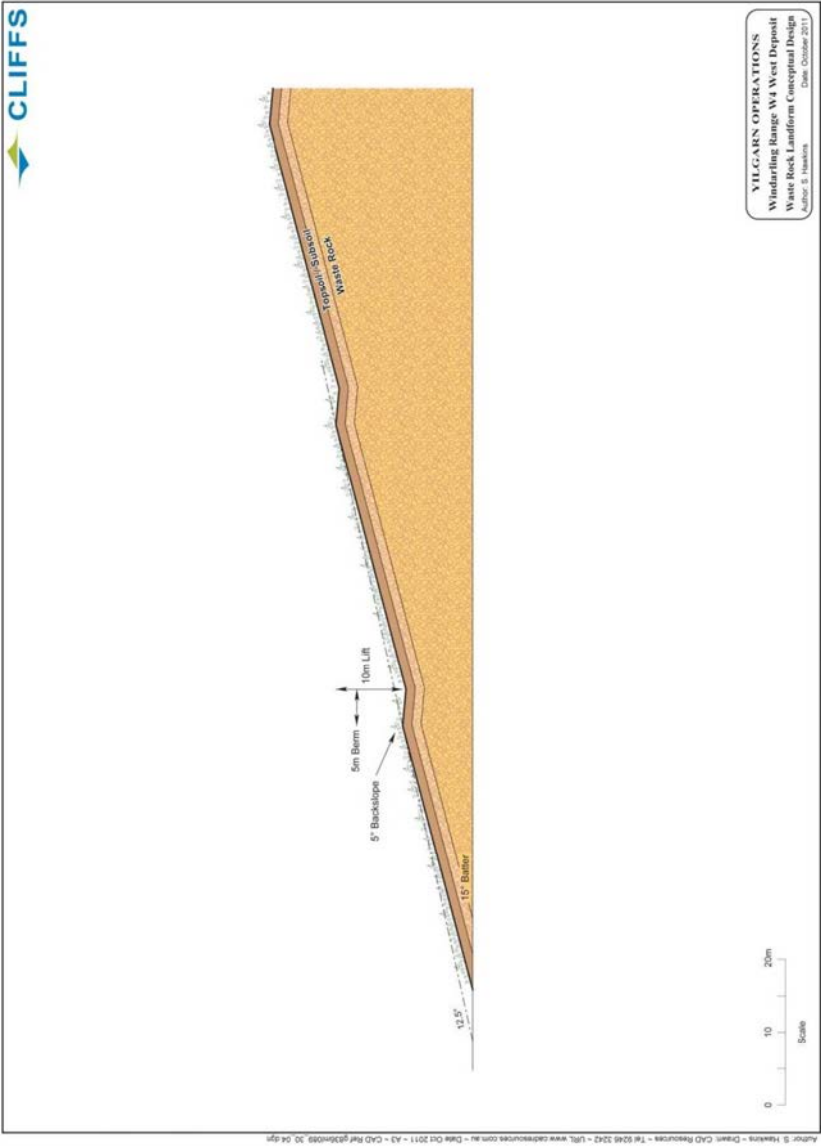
Conceptual Design Cross-section of the Windarling Range W4 West Deposit Waste Rock Landform. The conceptual design of the Windarling Range W4 West Deposit Waste Rock Landform is based on 10m lifts having a 15° batter, a 5m berm with a 5° backslope between lifts, and having an overall angle of approximately 12.5°. Topsoil and subsoil overlay the waste rock to provide a growth media for the rehabilitation works.
